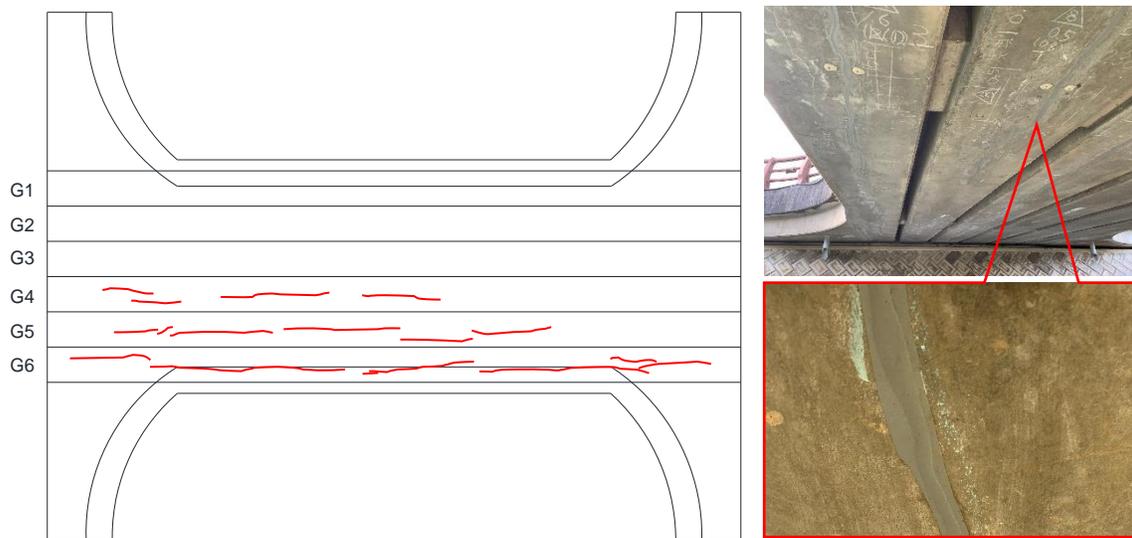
Measured cracks positions and patterns on the girders
